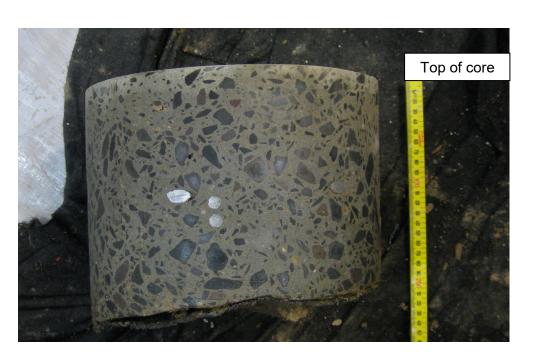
View of concrete core from Borehole BH8. Two layers of reinforcement steel (10 mm diameter) were encountered at 0.09 m and 0.10 m depth, with a layer of plastic at the underside of the slab.
